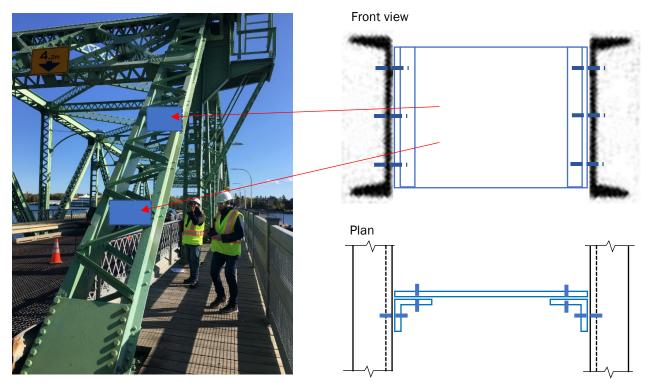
Intermediate bracing of two existing channels if work is performed with vehicular traffic over the bridge
